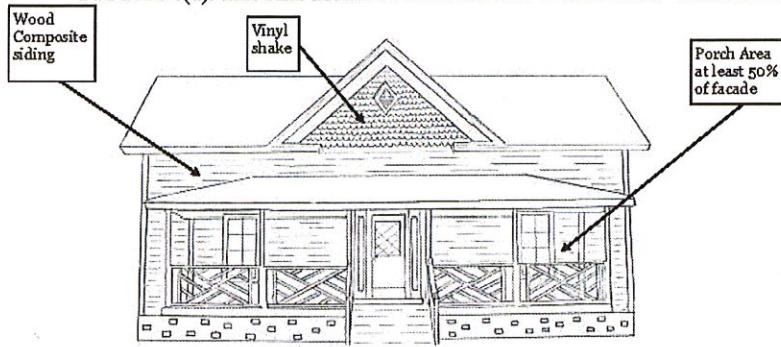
(d): SINGLE-FAMILY DETACHED DWELLING - FACADES
